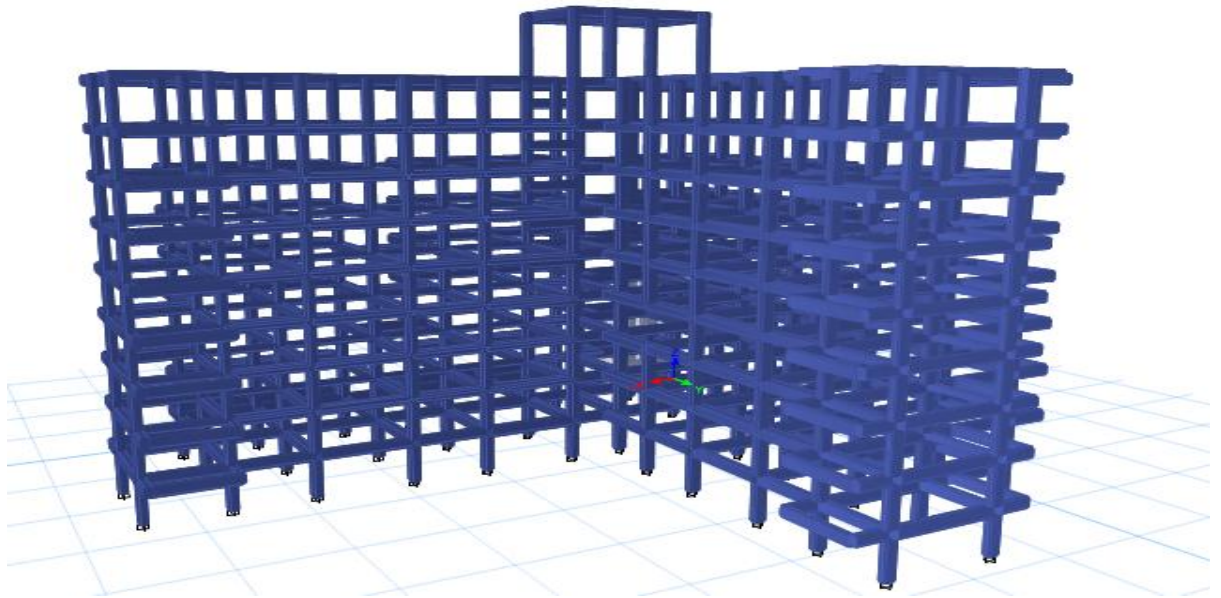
Three dimensional Eight Storey Nonlinear or RC L-Shaped Building without shear wall
